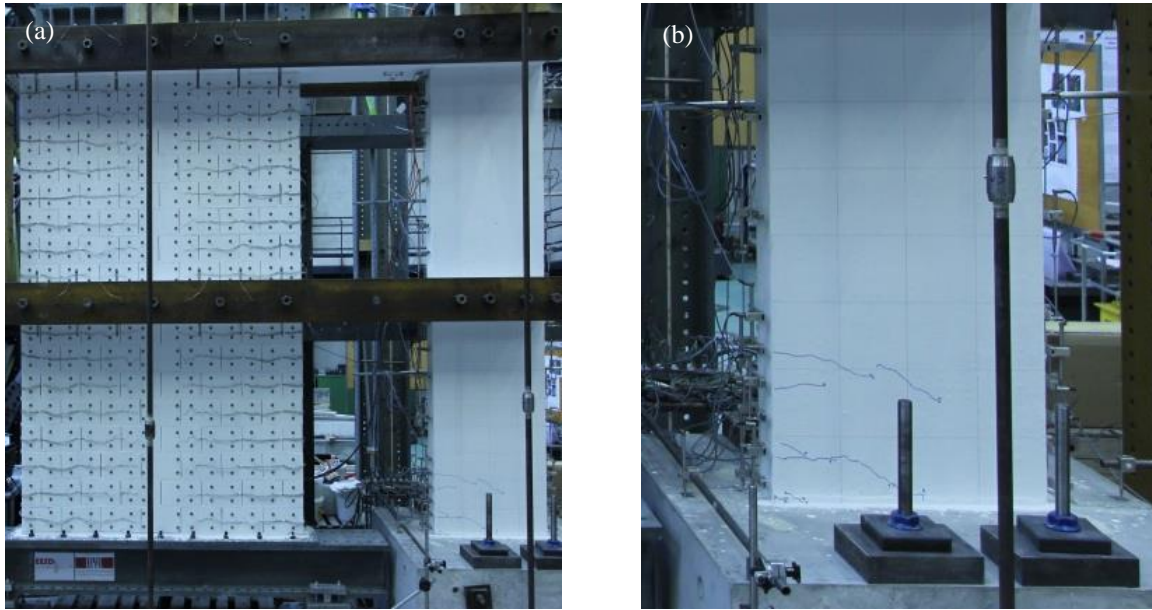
Crack pattern at LS10, $\delta = +0.1\%$. (a) specimen; (b) RC wall, first storey.
